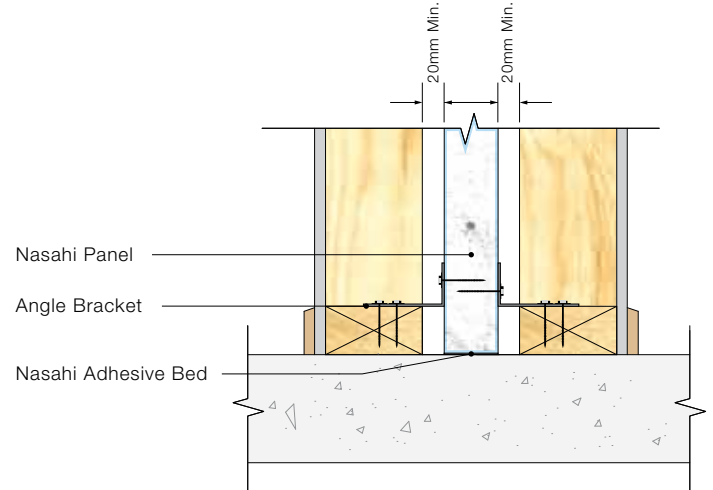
CONCRETE FLOOR TO CONCRETE SOFFIT
